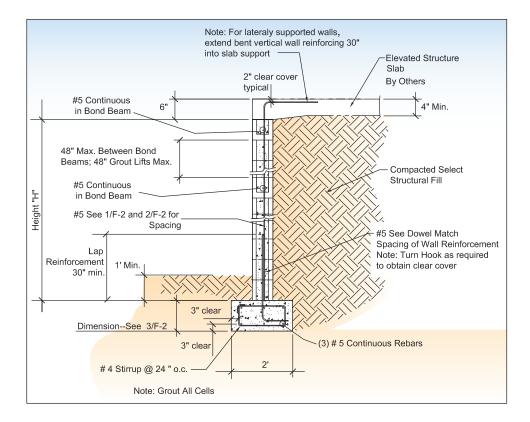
Profile of Case F foundation type (see Appendix A for additional drawings)
